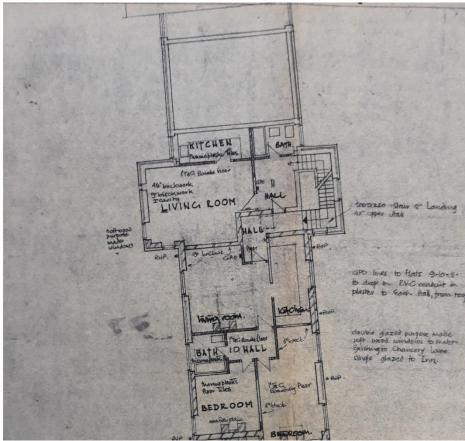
Plan showing the internal layout of the third and fourth floor following the reconstruction of the building
